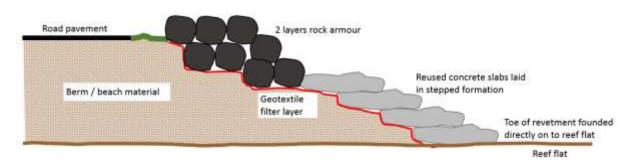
Cross-section of the proposed reconstructed revetment at Paal.
